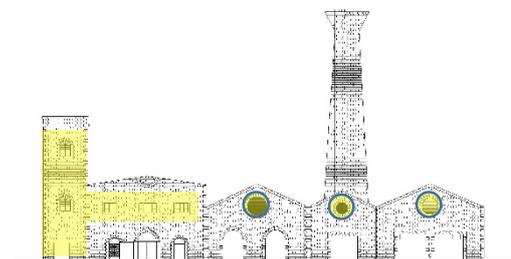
Termite Infestation - Fenestration, Windows and Doors, South-east Elevation, Tower, Barrack A, B, C and D, 15 to 17 A, East Wharf, KPT, Karachi
